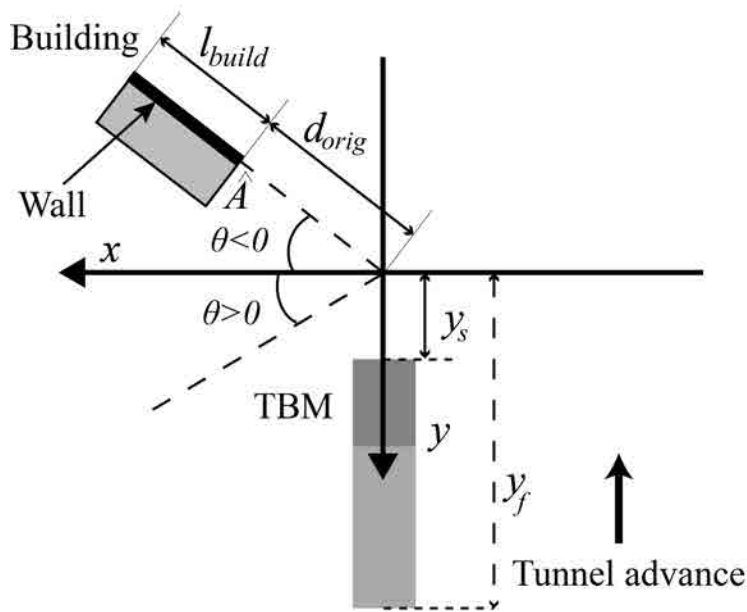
Tunnel and building positions (from Camós and Molins, 2014).
